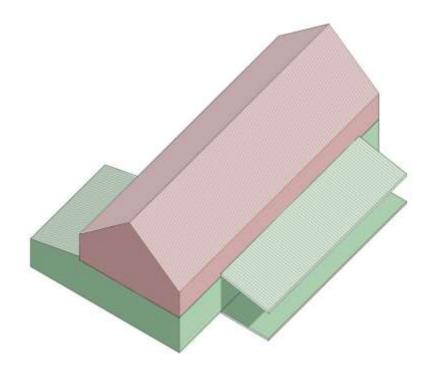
\_Diagram illustrating typical maximum allowable first floor area
